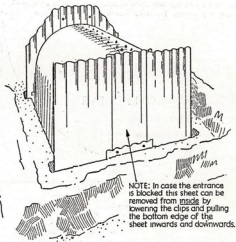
STAGE 9. VIEW OF BACK END OF SHELTER
